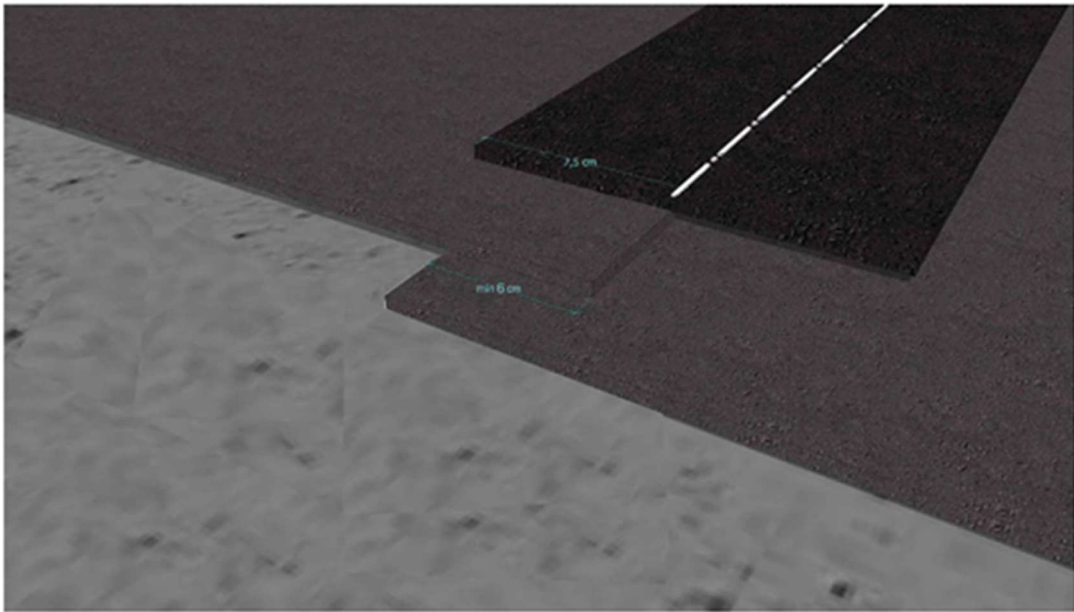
CROSS-CONNECTION OF MEMBRANE STRIPS – VIEW
